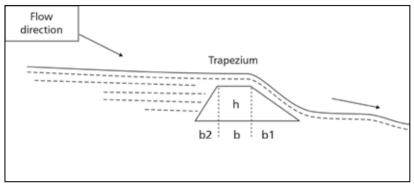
Cross-sectional View of a Stone Dam Source: Padilha (1997).
